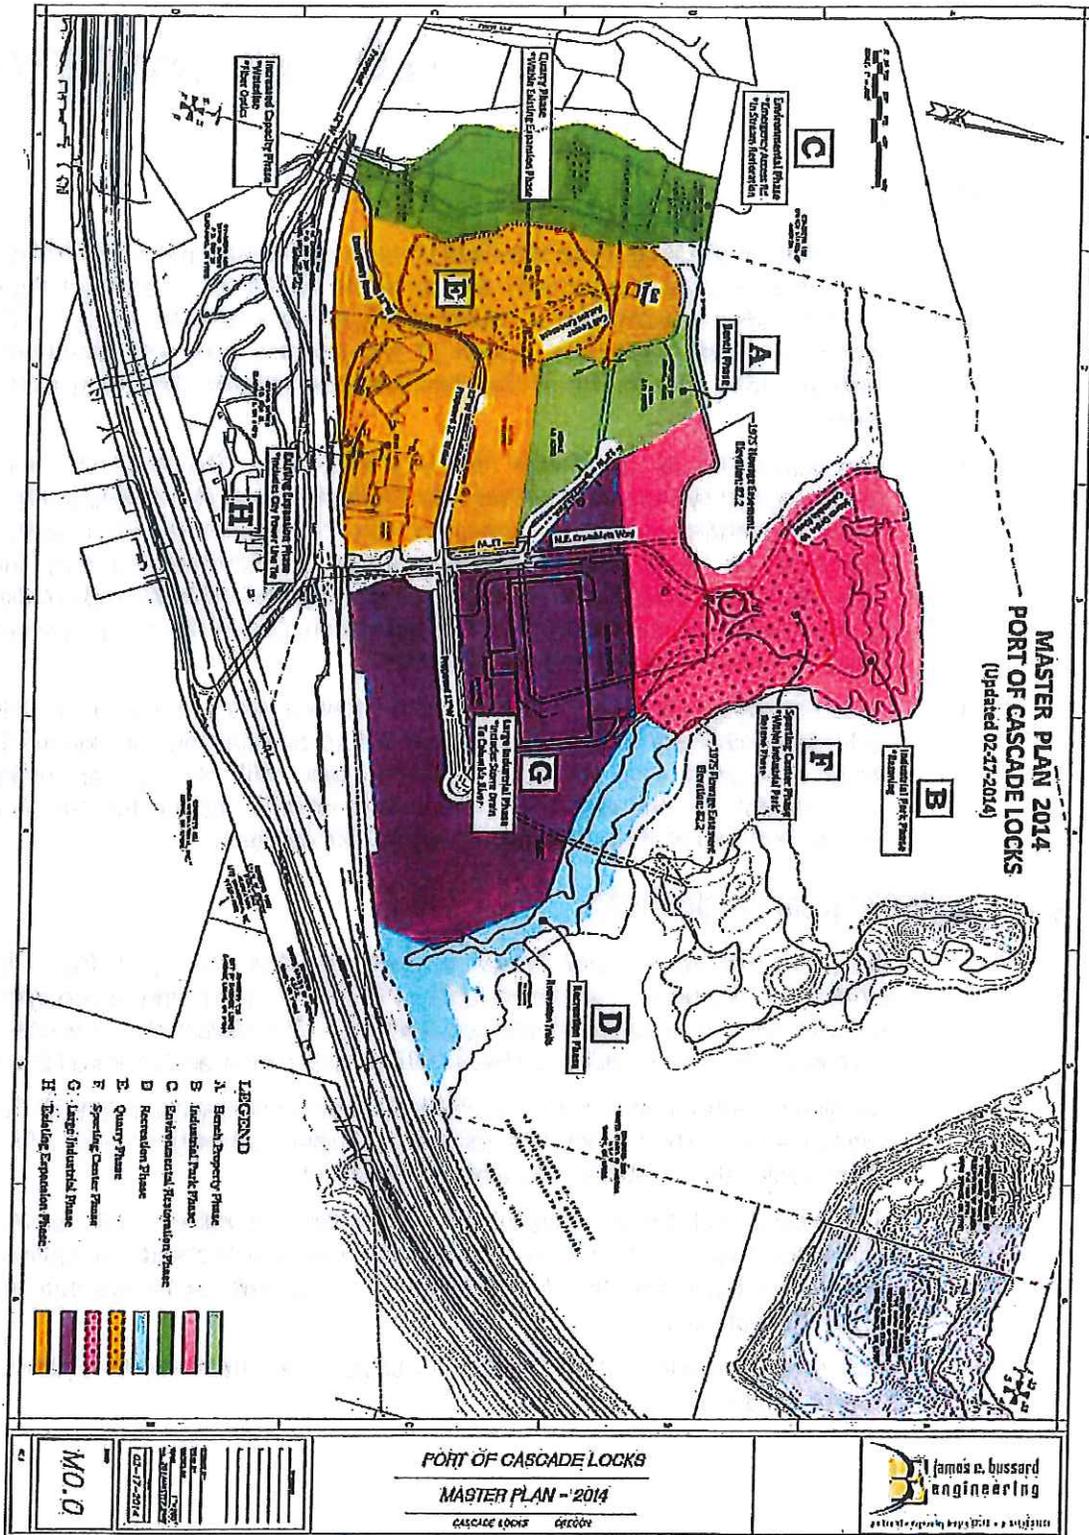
Port of Cascade Locks - Master Plan Excerpt
